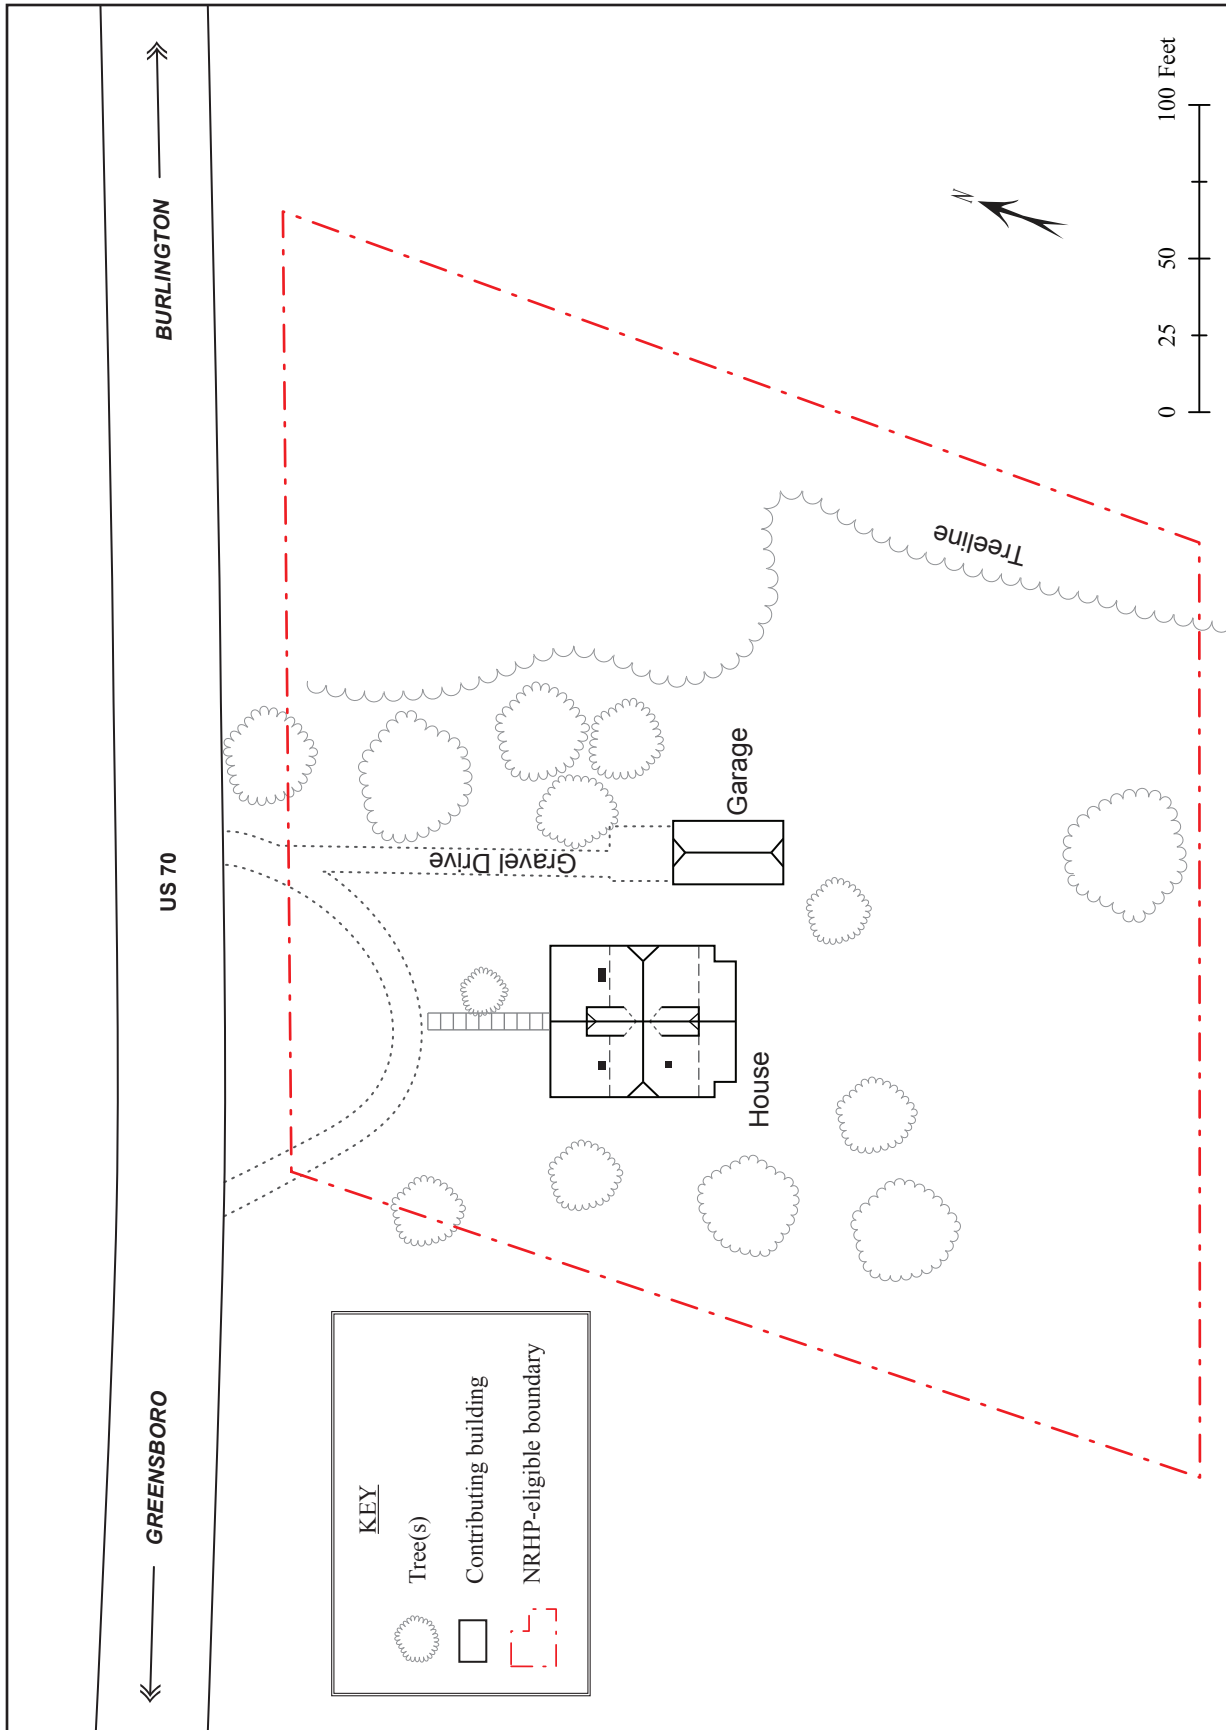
NCDOT Survey #15, Edwards House (GF-8177), 7210 Burlington Road, Guilford County, site plan and recommended NRHP boundary.
